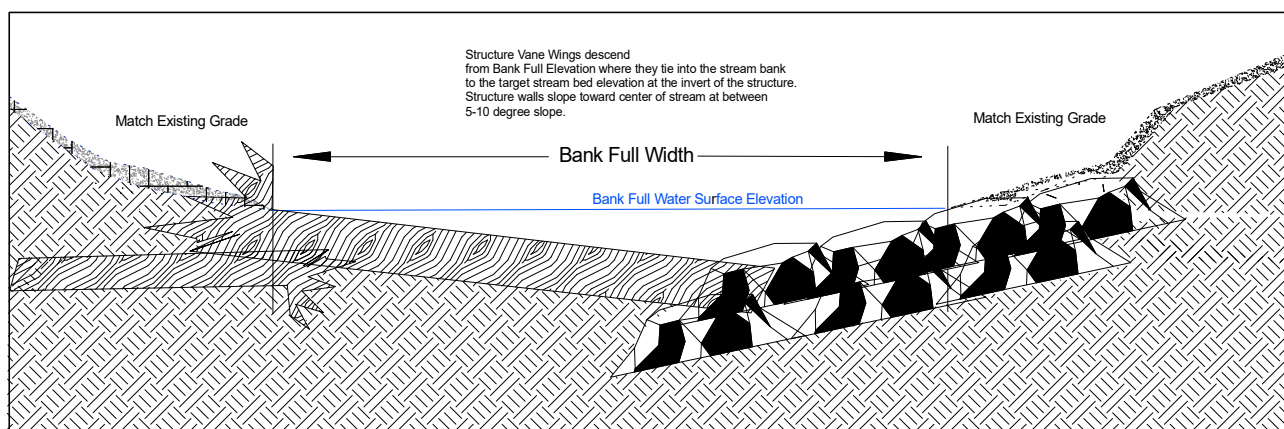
Log/ Boulder J-Hook Vane Plan View
